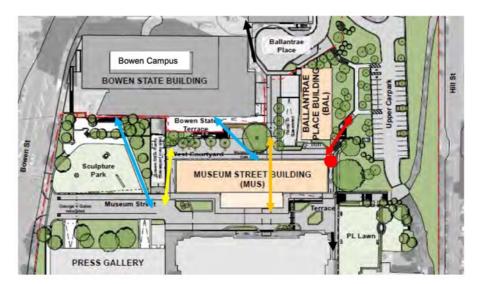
Future Accommodation Strategy Site Plan (source: Studio Pacific Architecture)
